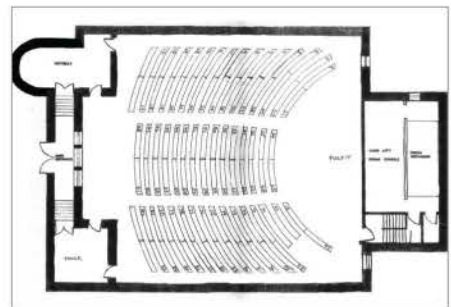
PLAN OF ST. ANDREW’S PRESBYTERIAN CHURCH, CARLETON PLACE, ARCHITECT SIDNEY BADGLEY, 1886. | MODERN PLAN SUPPLIED BY THE CHURCH
